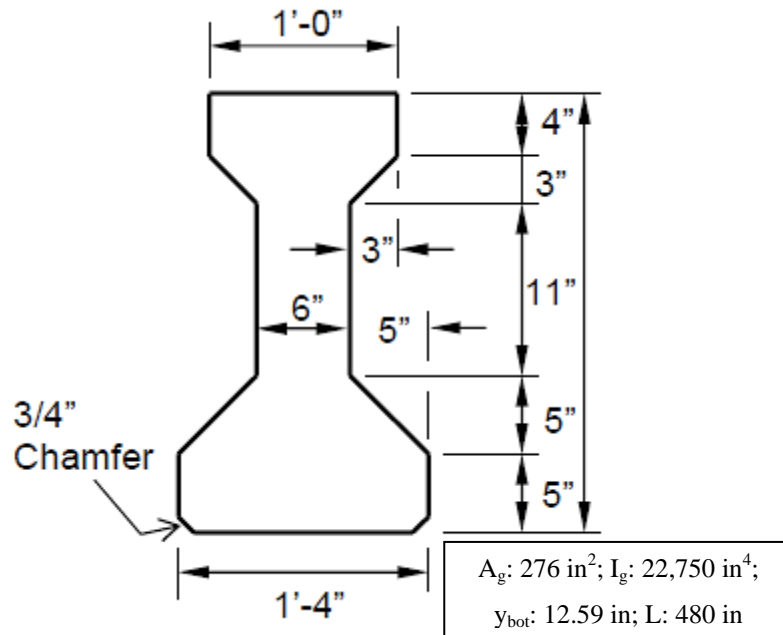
Cross Section of AASHTO Type I Girder (Adapted from Boehm [2008])
